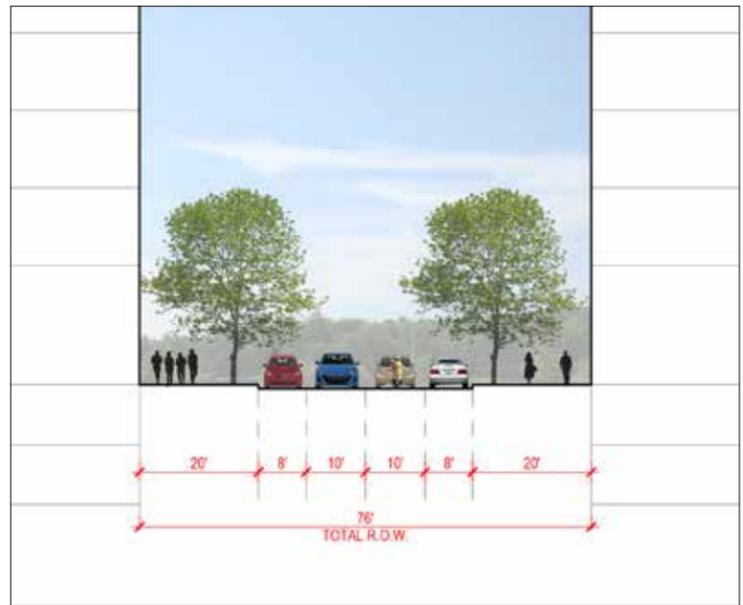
Cross section through typical "B" street without bike lanes
